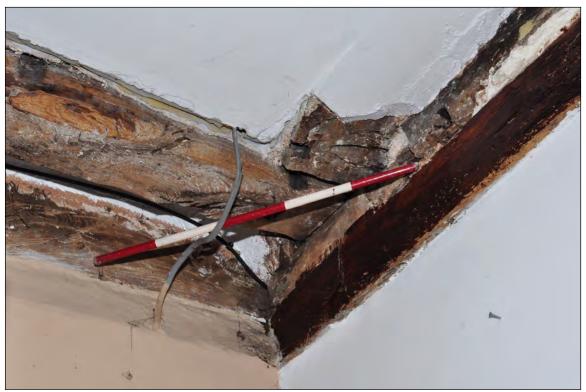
Beams 3 & 4, in dining room corner (before work). Looking west.
